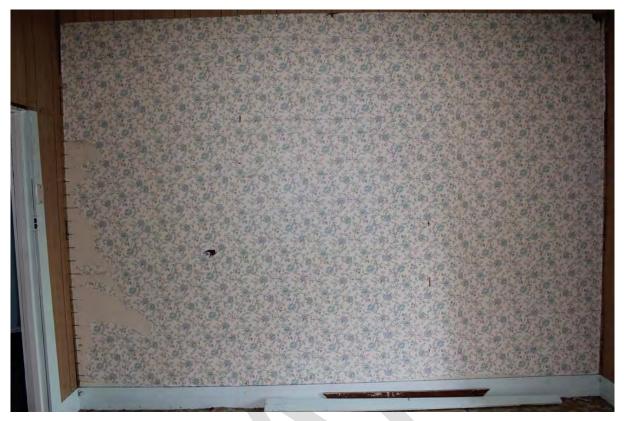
Internal original wall (bedroom 2) showing wallpaper and weatherboard construction
